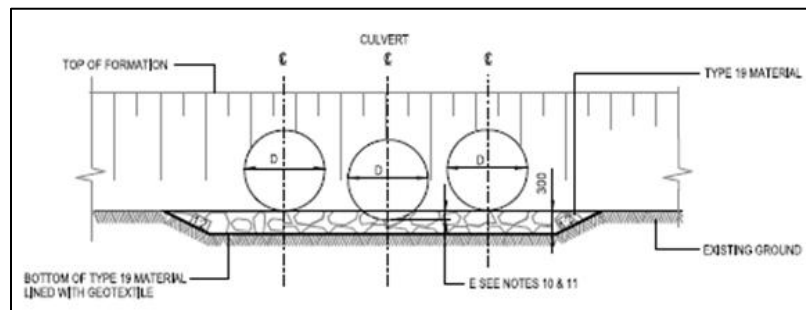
Multiple Pipe Culvert with Fish Passing
